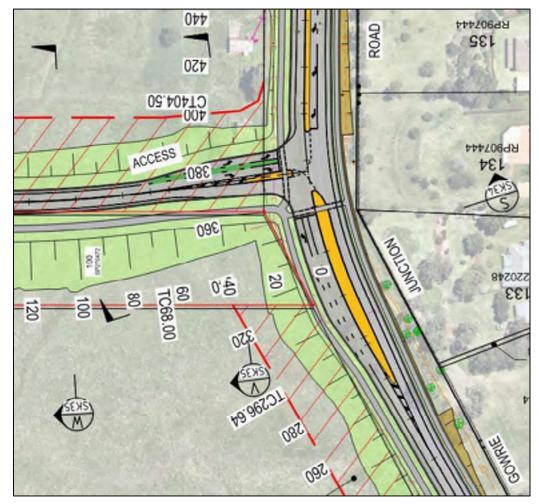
Gowrie Junction Road/TRSP Access Road intersection layout (provided by Council)
